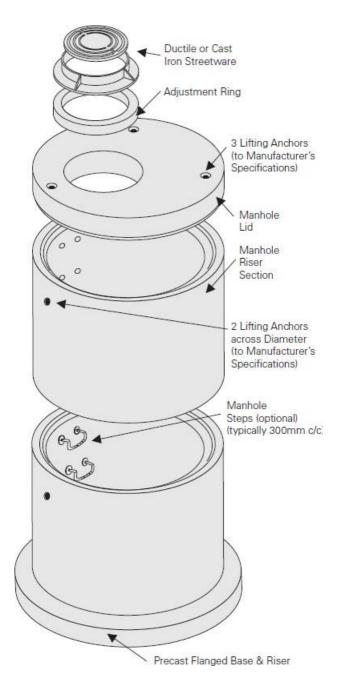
Schematic Diagram of Precast Manhole General arrangement
